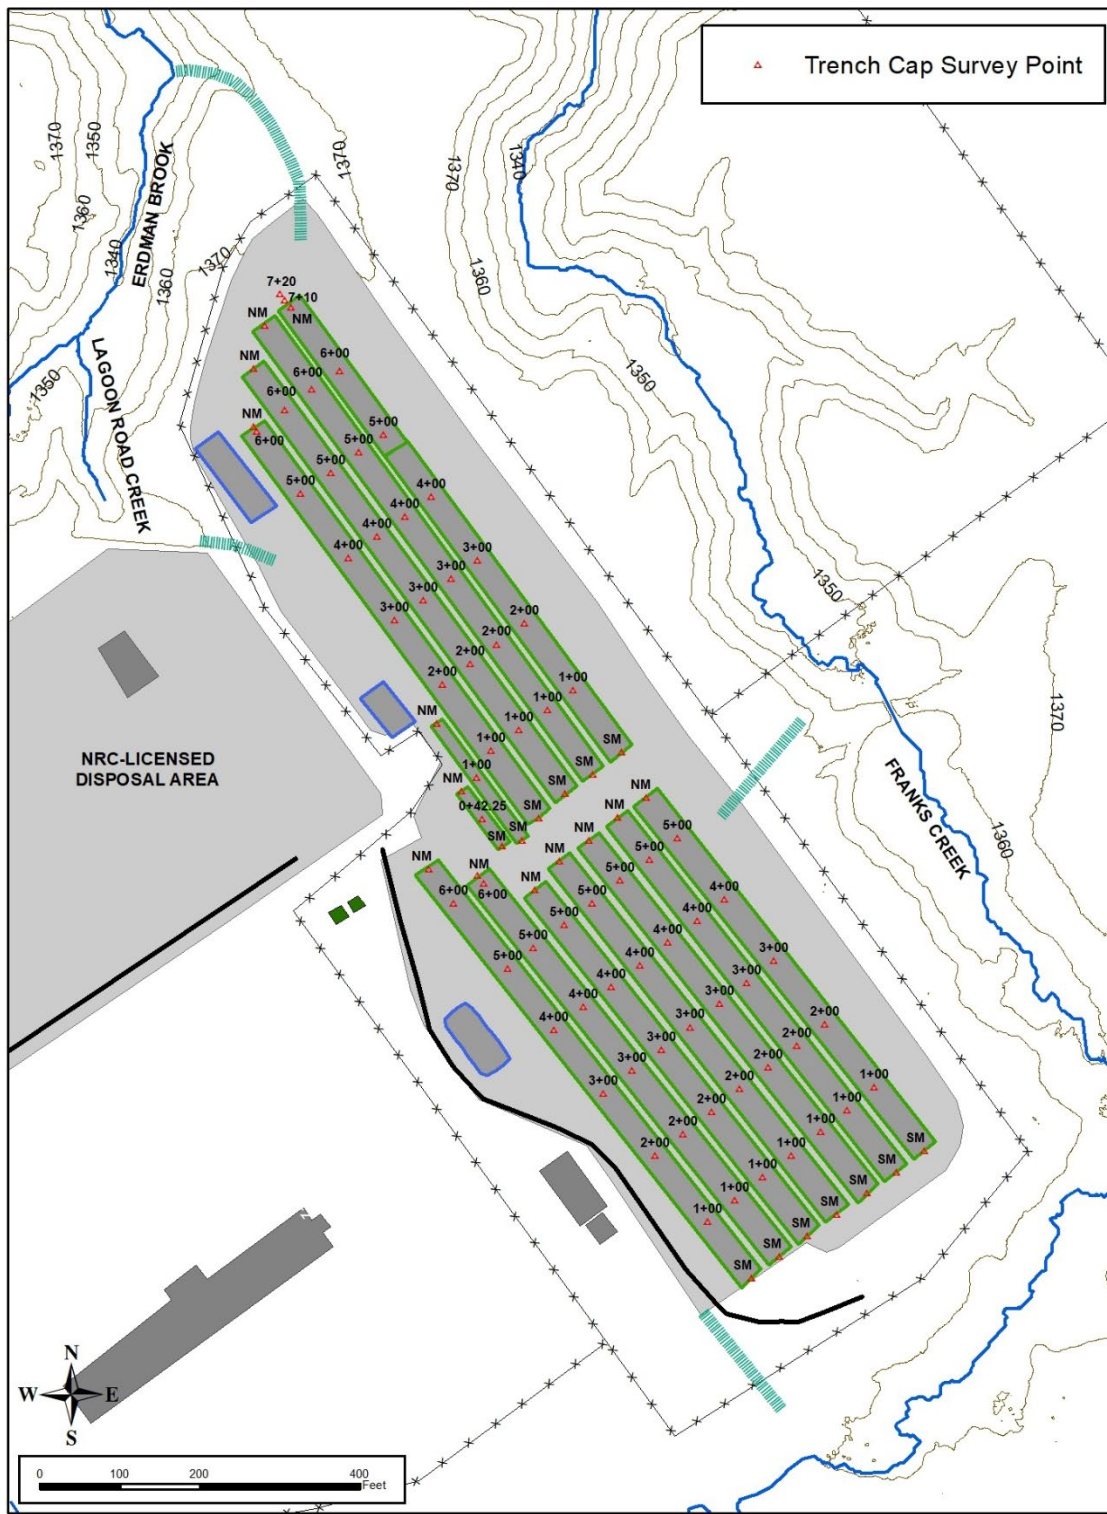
Trench Cap Ground Surface Elevation Survey Points
